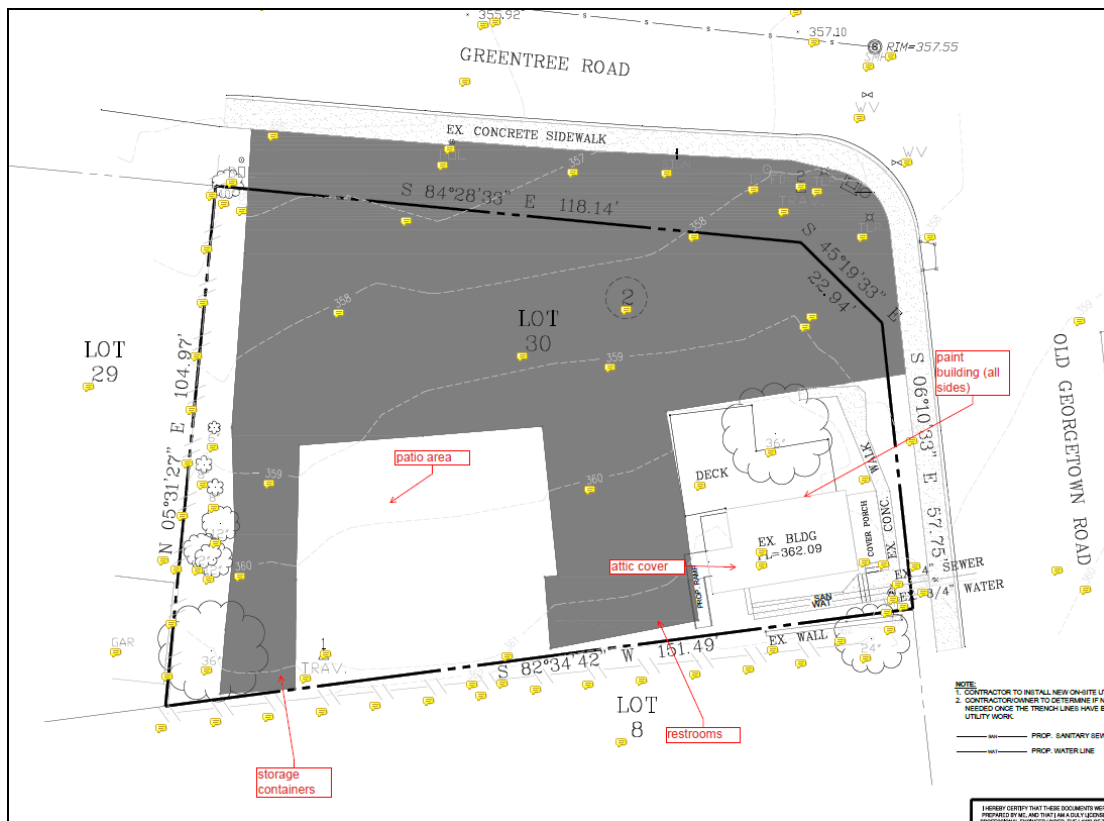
Applicant's submitted Site Plan showing the proposed patio area, location of restrooms and storage lockers, and the location of the attic hatch covering.
